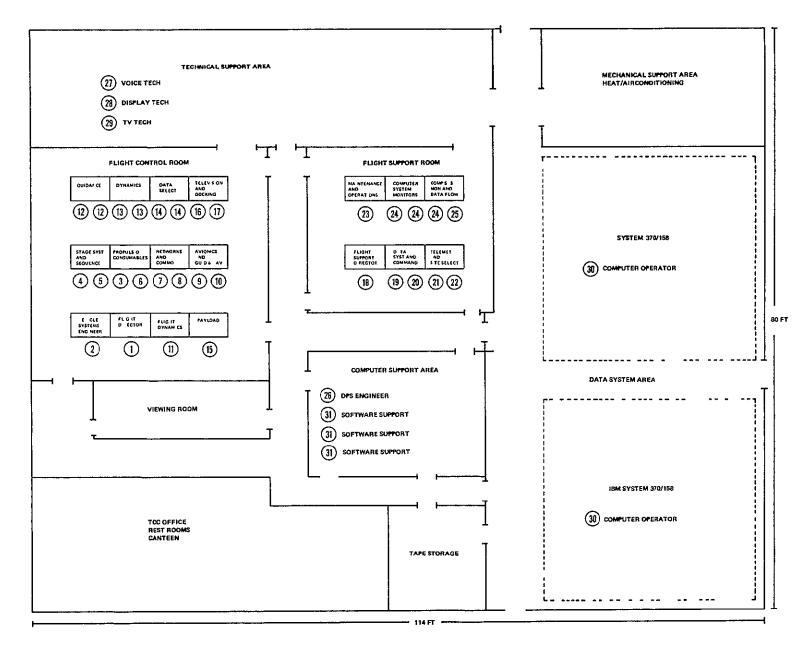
2 1-1 Representative Floor Plan and Support Staff Stations
